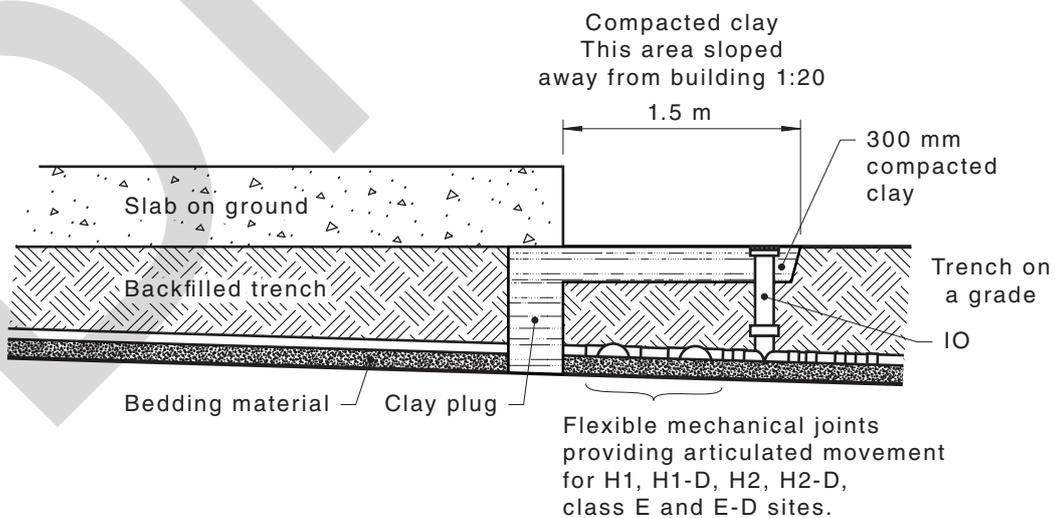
(A) TYPICAL INSTALLATION OF CLAY PLUG
